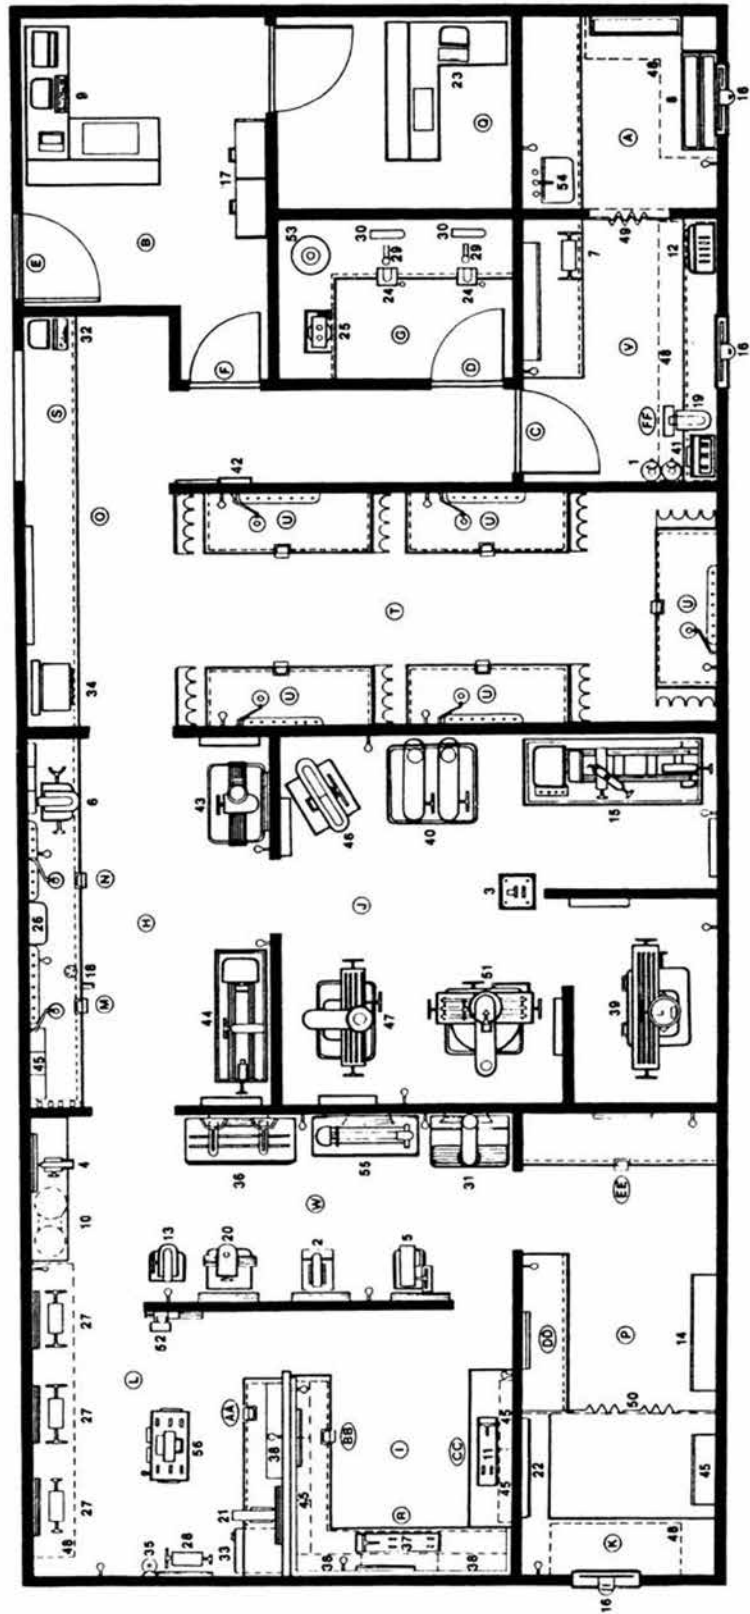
Floor plan layout of a modern production gunsmithing facility.
